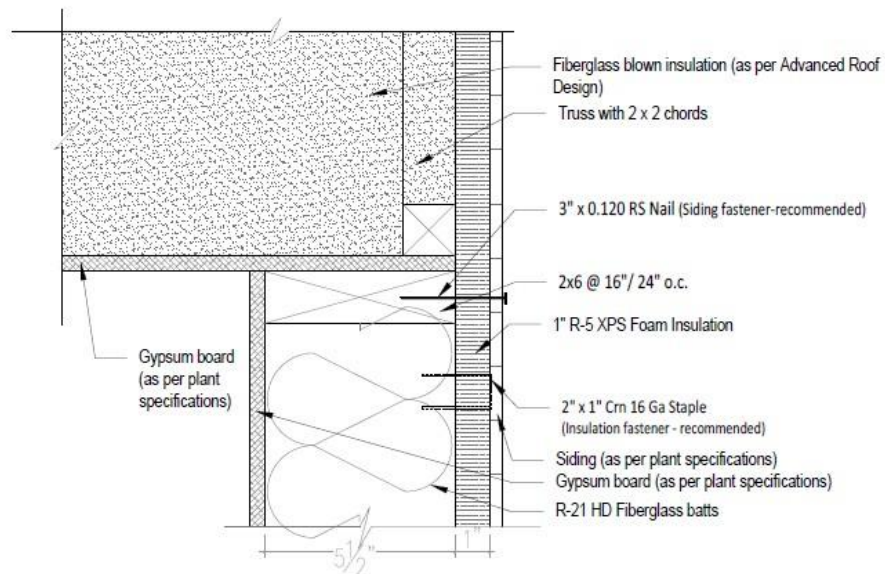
through Figure 22 are construction details incorporating the exterior CI to the wall assembly.
